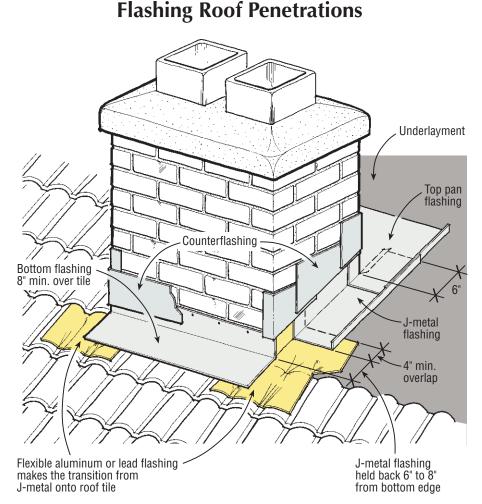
The sides of dormers, skylights, and chimneys are flashed with galvanized pan flashing, which terminates on a piece of flexible aluminum. The aluminum flashing conducts the water onto the top of a course of tiles below the roof penetration.
